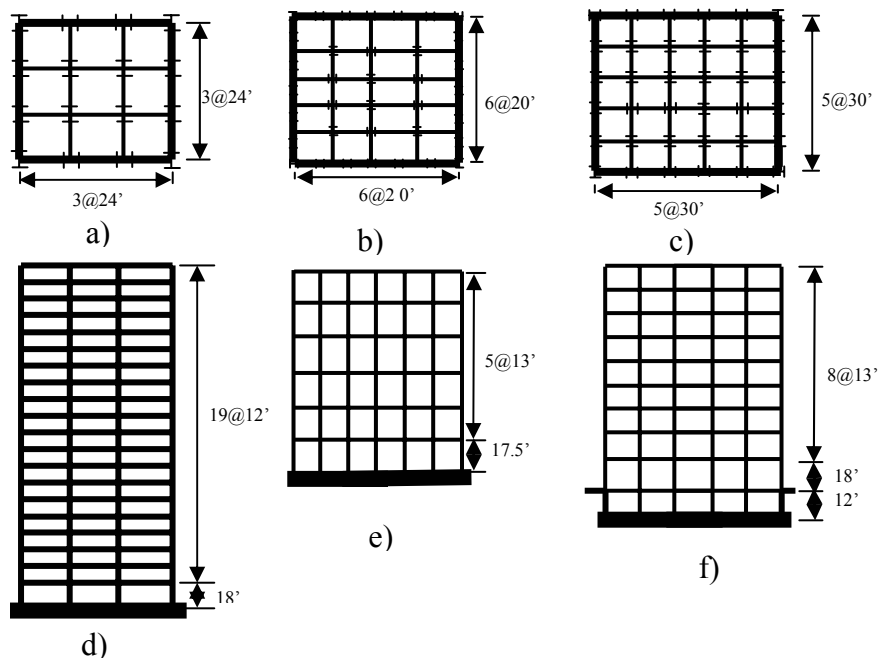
Floor plans and elevations of the buildings used in the multistory study
